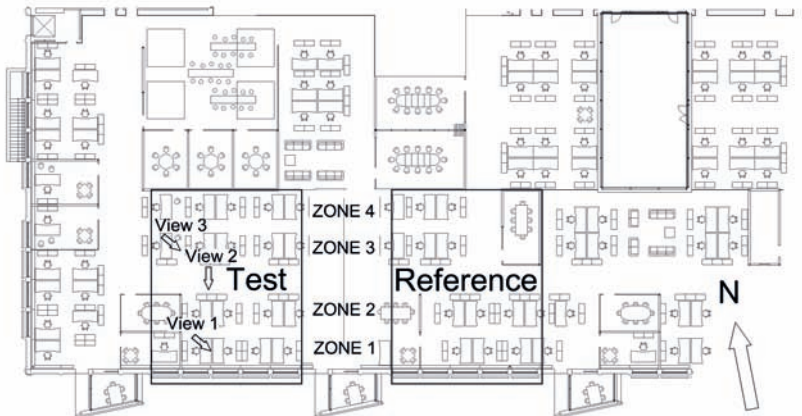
The layout of the building with open-space offices and marked view directions and lighting zone positions.
